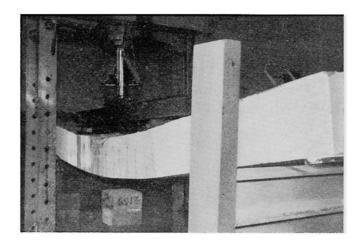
A beam with a bent plate joint and failure due to crushing of the concrete.
